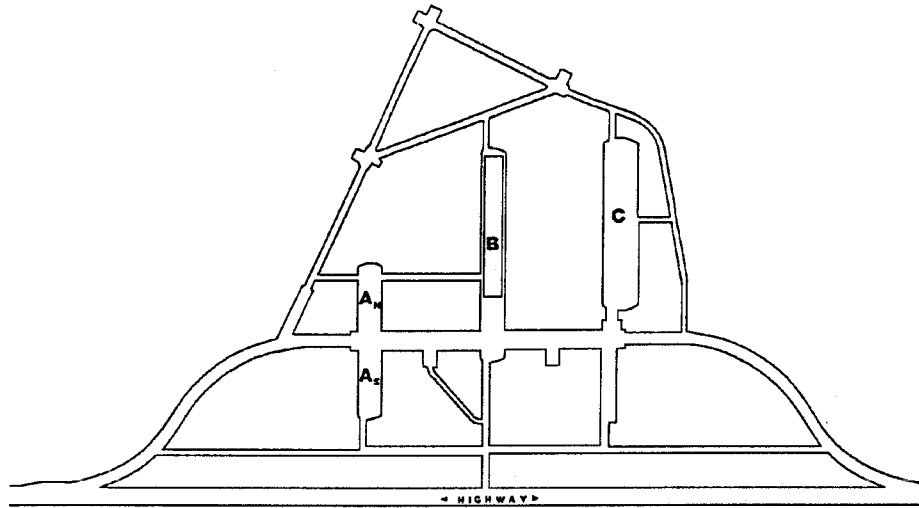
The layout of the Gran Sasso underground laboratory. One of the twin roadway tunnels and the three underground Halls (A, B, and C) are shown. MACRO is represented by the rectangle in Hall B [53].
